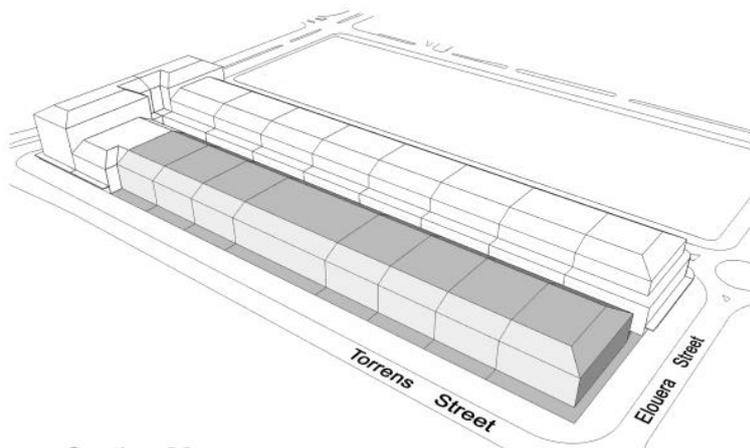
Braddon – Building Envelope (Blocks 1 to 4, 7, 8, 10, 11 and 21, Section 29)
